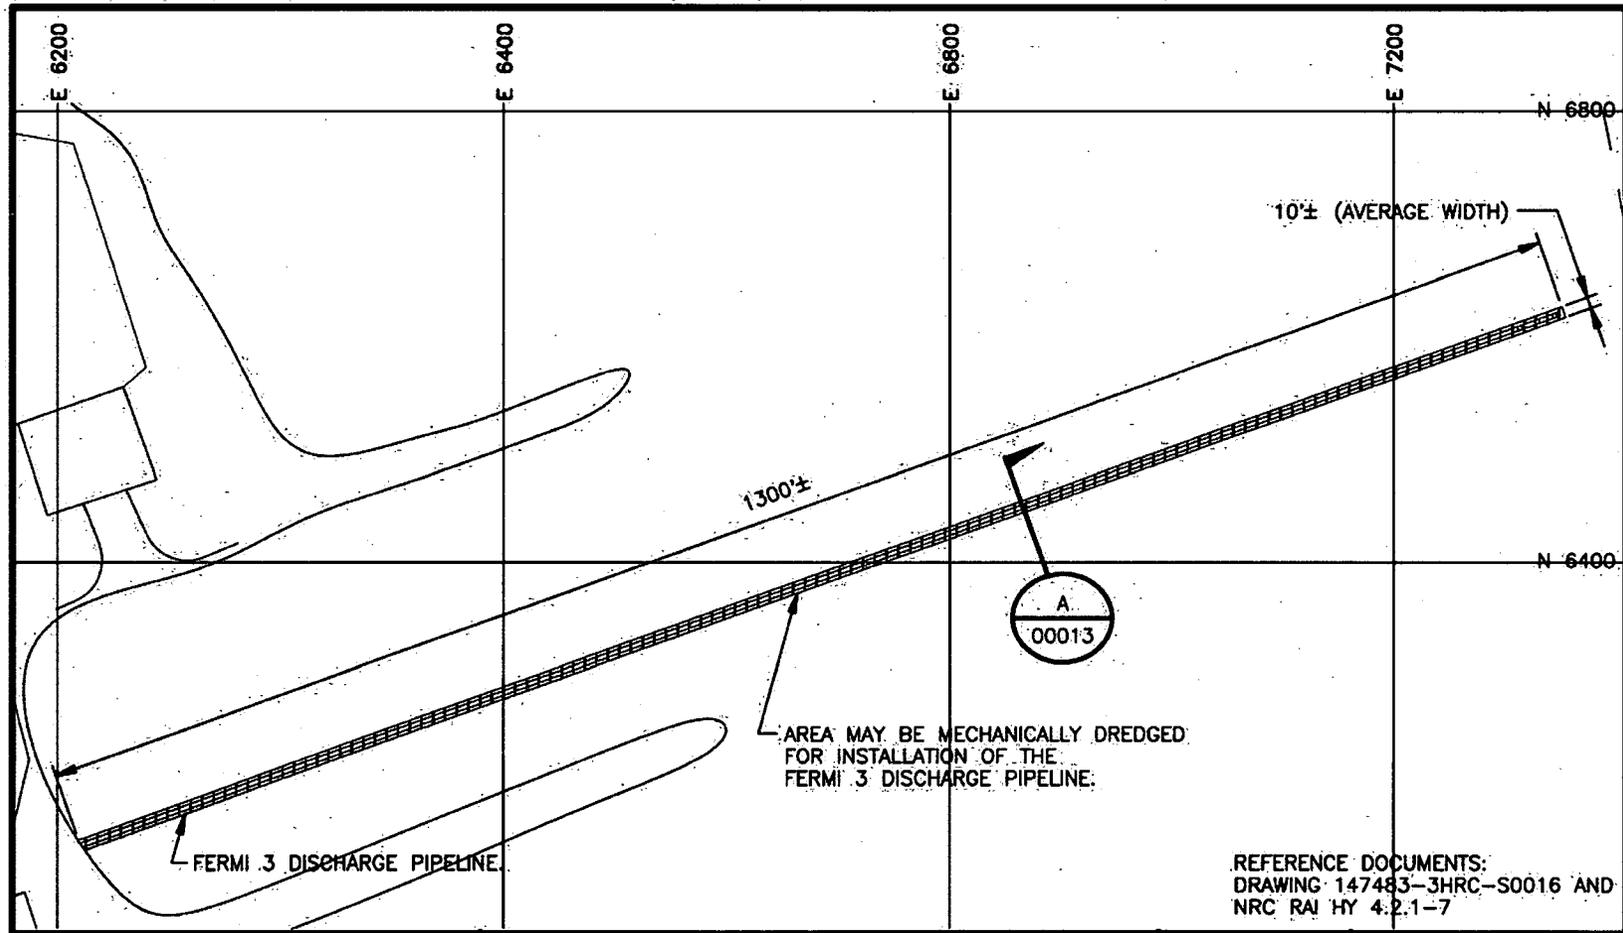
Fermi 3 Discharge Pipe Dredging Cross Section
